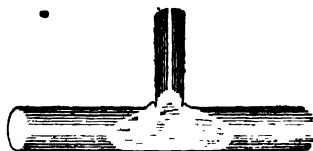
B.R.C. Fabric showing the Weld between Longitudinal and Transverse Wires.
